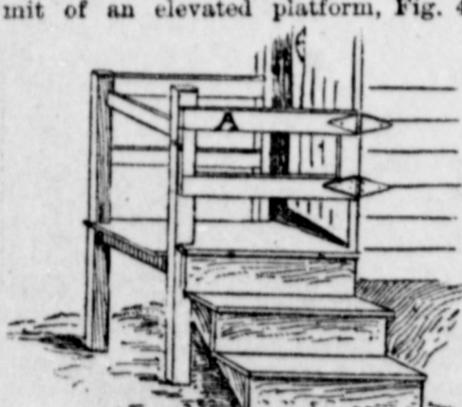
FIG. IV—PLATFORM FOR LOADING HOGS, placed at one end of the house. It should be substantially made and have a gate, A, at one side. The gate bars a hook and when not in use is folded back and fastened to a staple in the wall.
